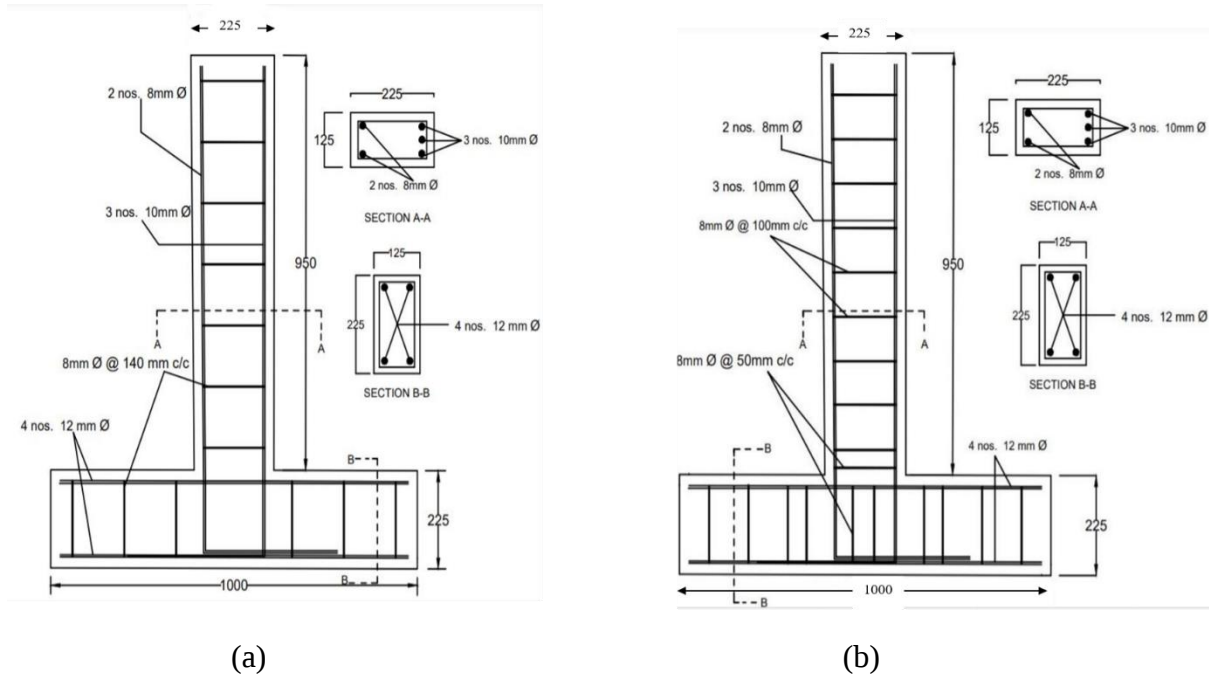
Reinforcement detailings of RC Exterior (a) non-seismically detailed, and (b) seismically detailed BCJ
